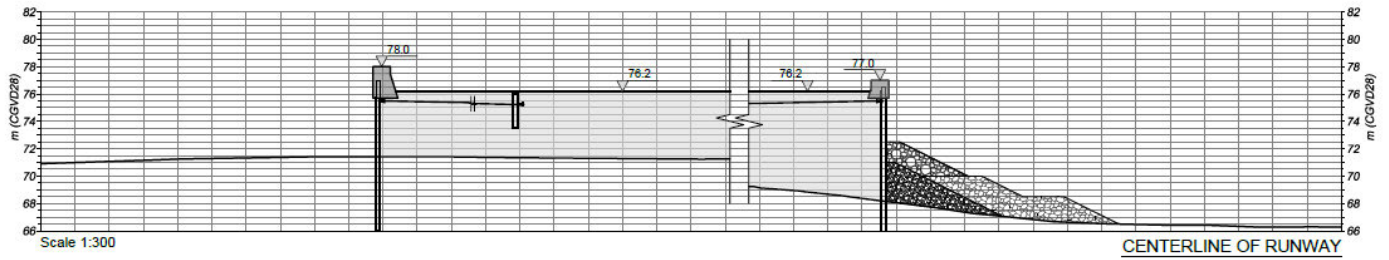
Typical Vertical Retaining Wall (Sheet pile) Technical Section
